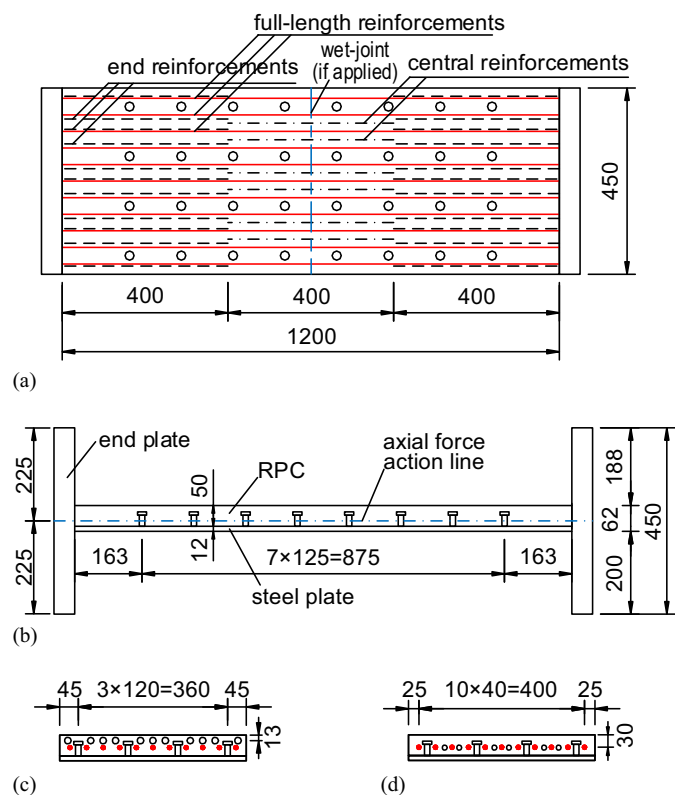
Details of panels: (a) plan view; (b) elevation (Note: All dimensions are in millimeters)
